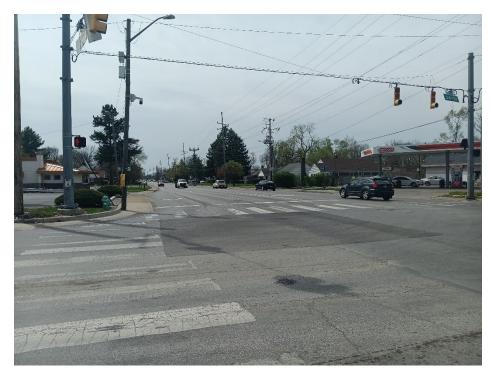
Looking south down Keystone Avenue from 35th Street.
